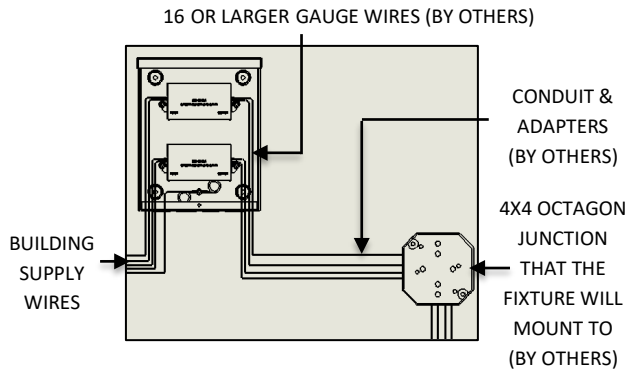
TWO DRIVER REMOTE BOX SETUP FOR 24" & 36" SERIES
